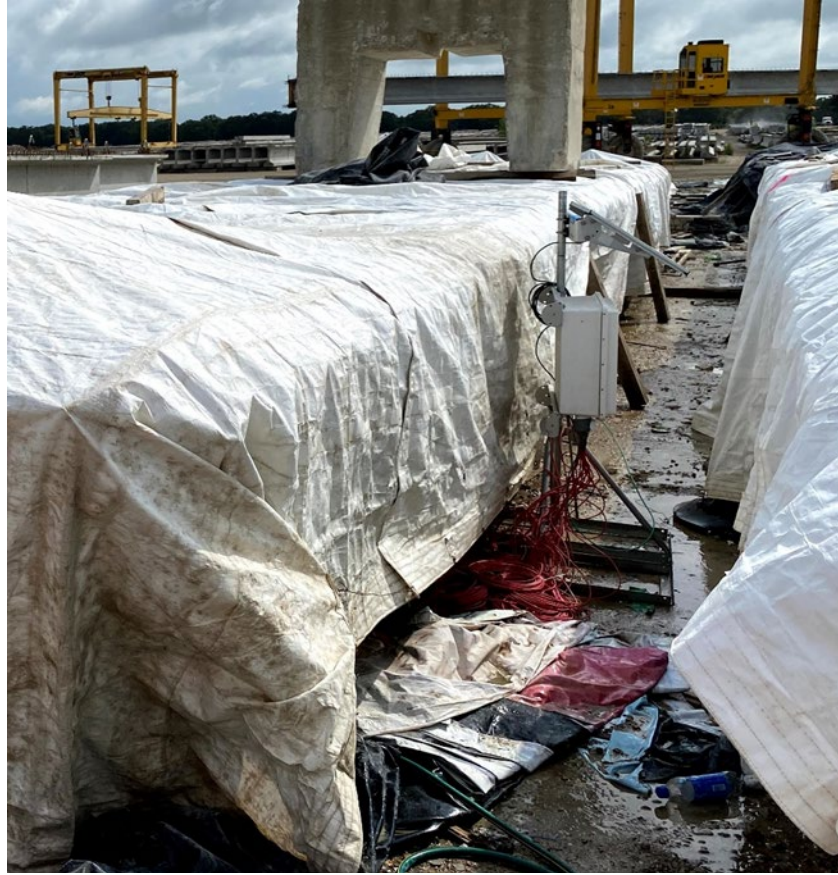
DAQ System Equipped with Solar Power Setup at Precast Plant
